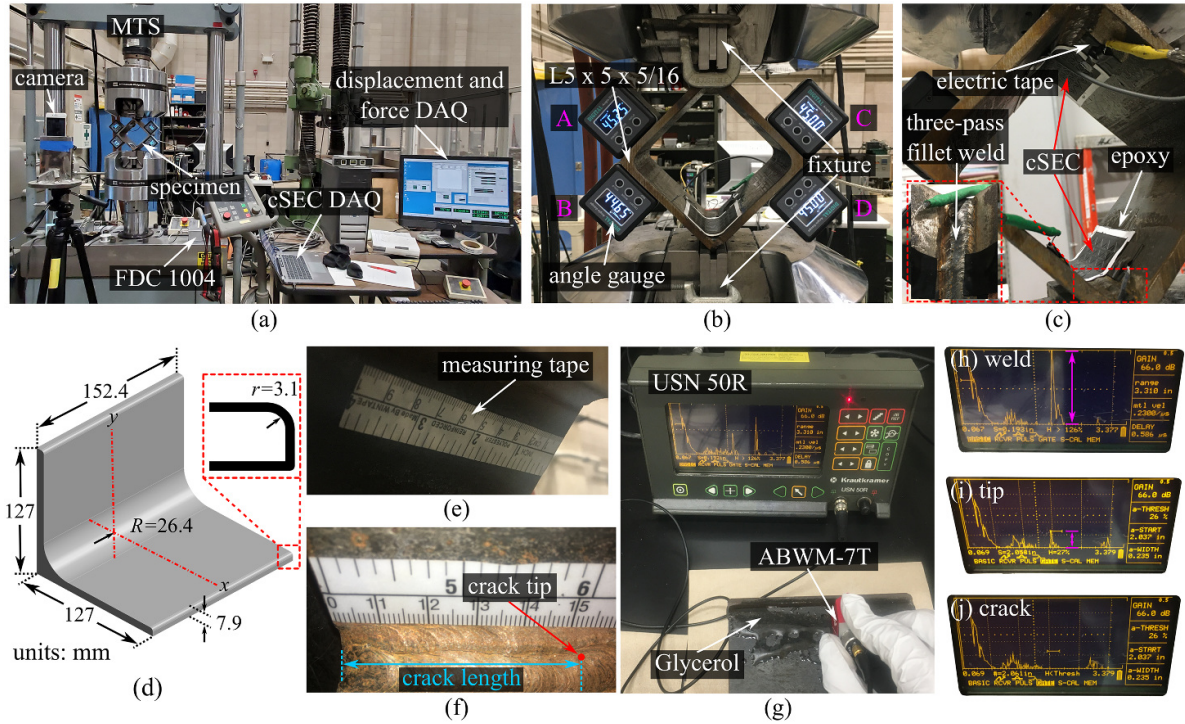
(a) Overall experimental configuration (the arrow indicates the loading direction); (b) zoom on the front side of the welded specimen showing the digital angle gauges and custom H-shape fixture; (c) zoom on the back side of the welded specimen showing cSECs with the onset showing the detail of three-pass fillet weld; (d) geometric configuration of the $L5 \times 5 \times 5/16$ L-shaped channel; (e) measuring tape adhered next to the welded at the top corner of specimen 0; (f) picture of a fatigue crack propagated over 52.1 mm; (g) experimental setup for UT testing; and pictures of transmission pulse and defect echo under (h) weld; (i) crack tip; and (j) crack.
